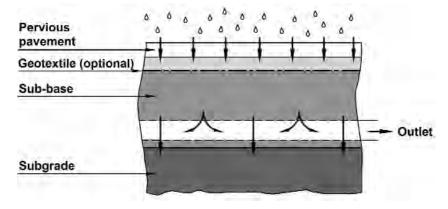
(b) Pervious pavement system types: Type B - Partial Infiltration
